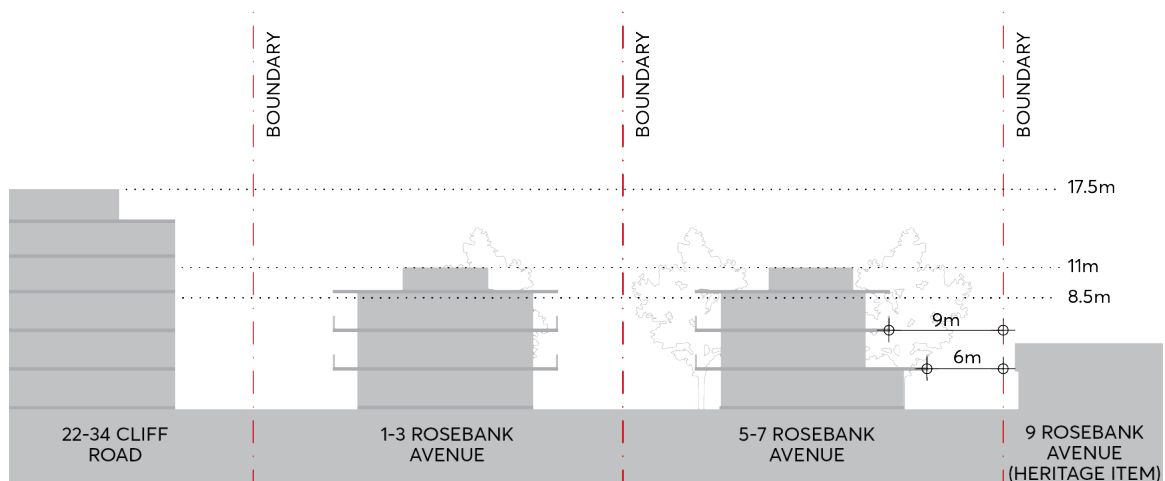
Setback controls for 5-7 Rosebank Avenue
